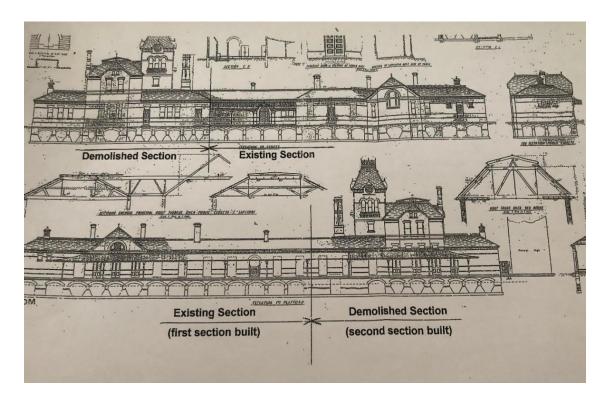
Planned drawing of the demolished and existing buildings (Source: EMM)
